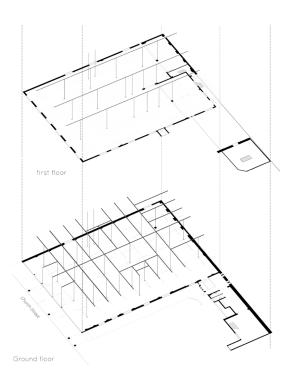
Existing floors and structural column distribution (Author 2013)
